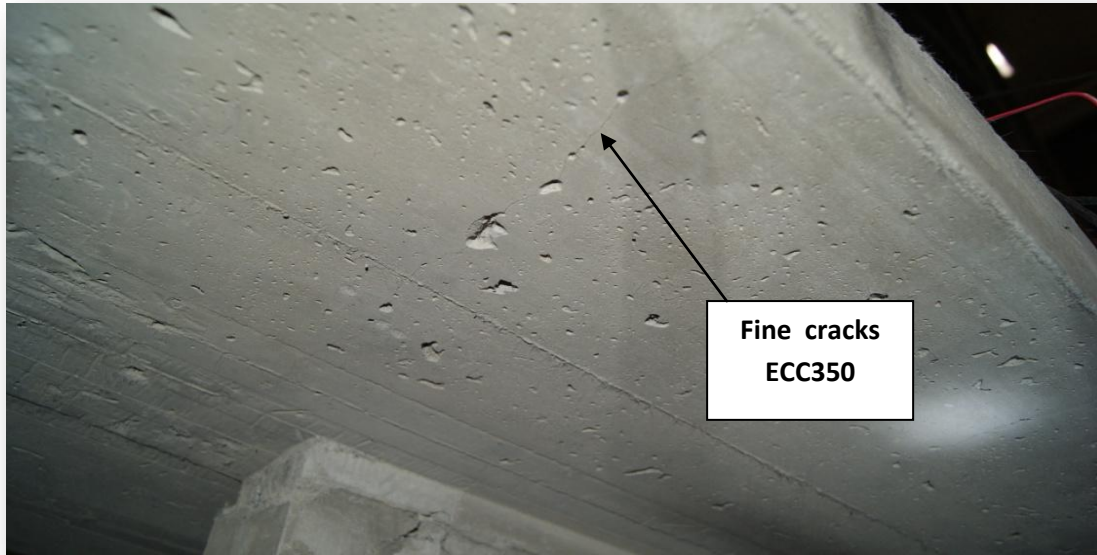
Crack development and crack propagations in ECC350 specimen at inner edges of the fixed wall
